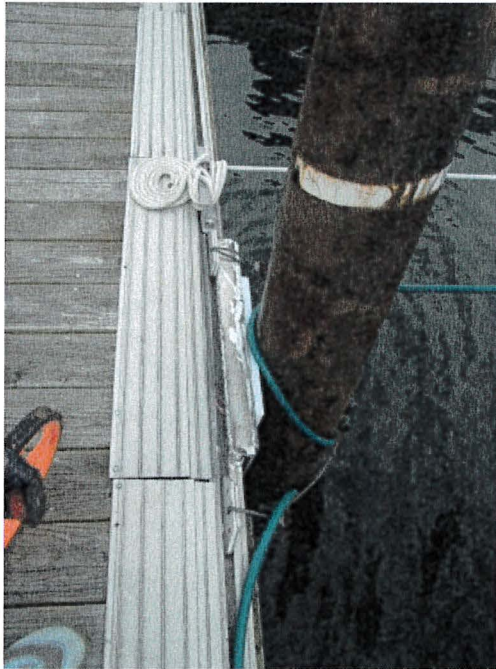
West Main – Dock C. Picnic Dock. Minor Corrosion on Handrailing Bolts and Cover Frame Structure
